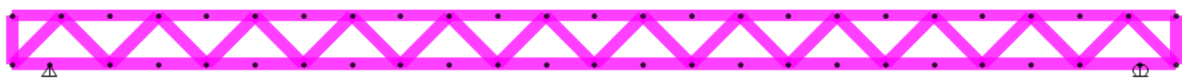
Elevation view of the 3D-printed RC beams as modelled in SAP2000 [11].
